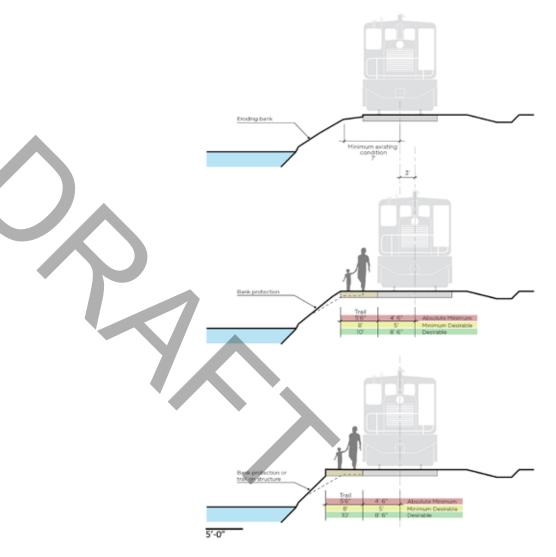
Existing condition and proposed rail + trail section provided by Alta Planning
